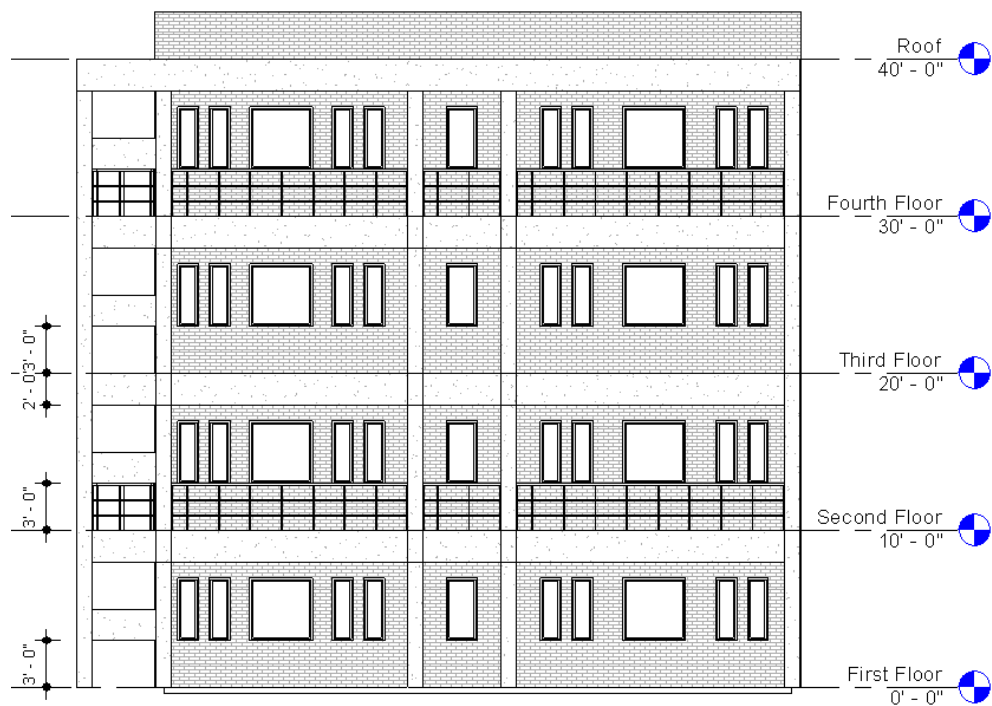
The north elevation for creating structural elements for Design Option 2
